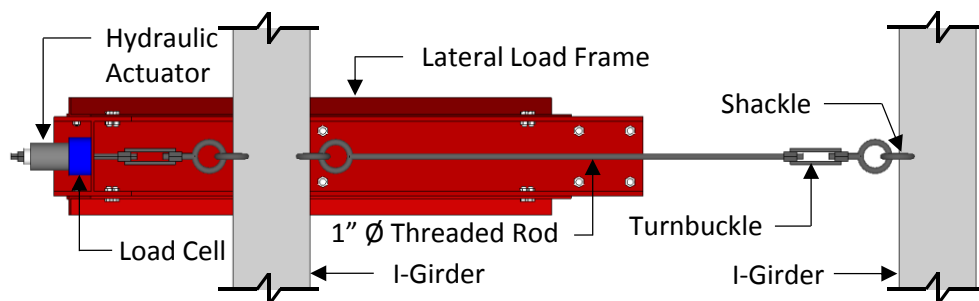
Twin I-Girder Lateral Load System - Plan View
